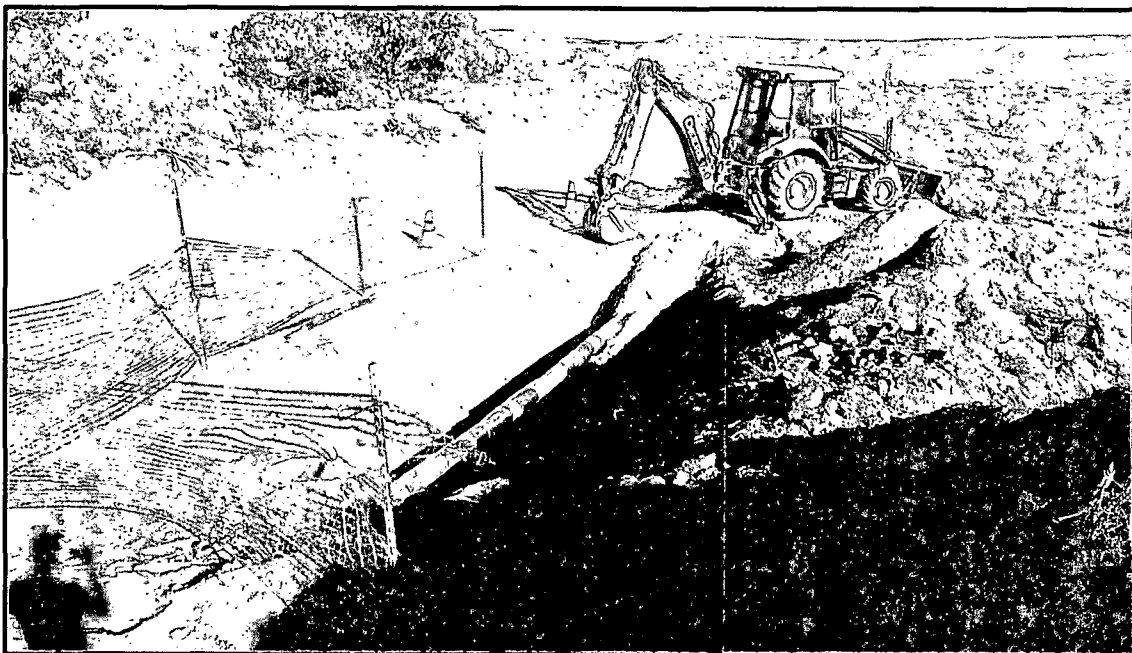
View of Lateral C-27 pipeline excavation at its fullest extent.
